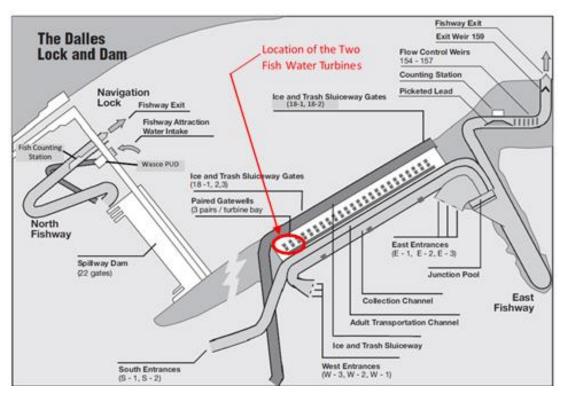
Spillway, Fishways, Powerhouse and Other Structures at The Dalles Dam
